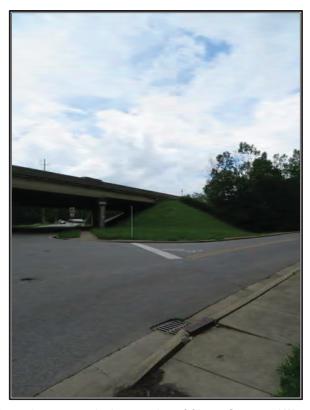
Overview of the project area at the intersection of Cherry Street and West Street, facing northwest.
